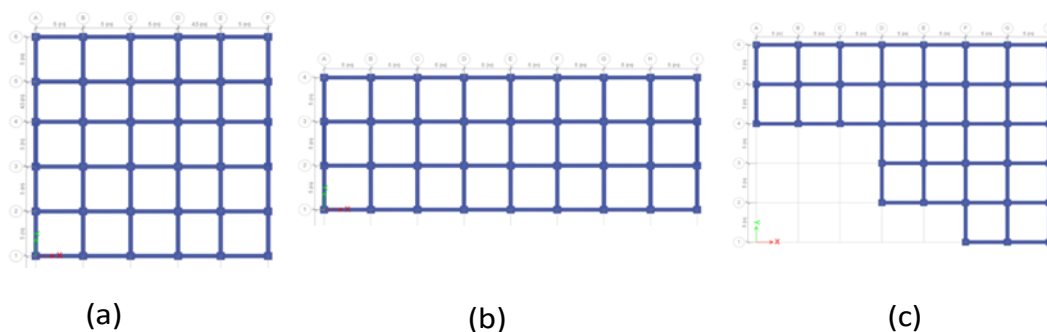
Floor Plans Of Regular and Irregular Multi-Story Buildings, (a) Square Buildings, (b) Rectangular Buildings, and (c) Irregular Buildings
